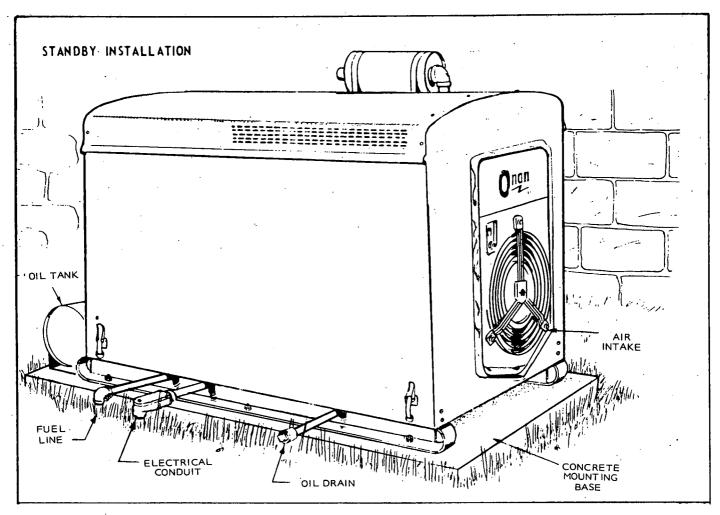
TYPICAL OUTDOOR INSTALLATION
